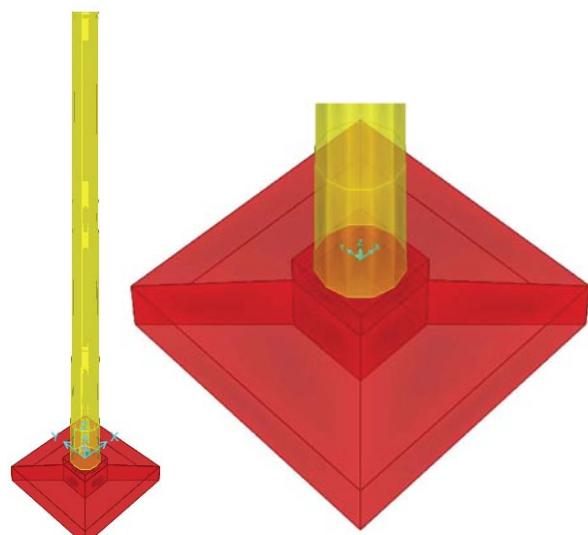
Tapered frame model on RC spread footing (a) and close-up of the 3D footing element (b).
